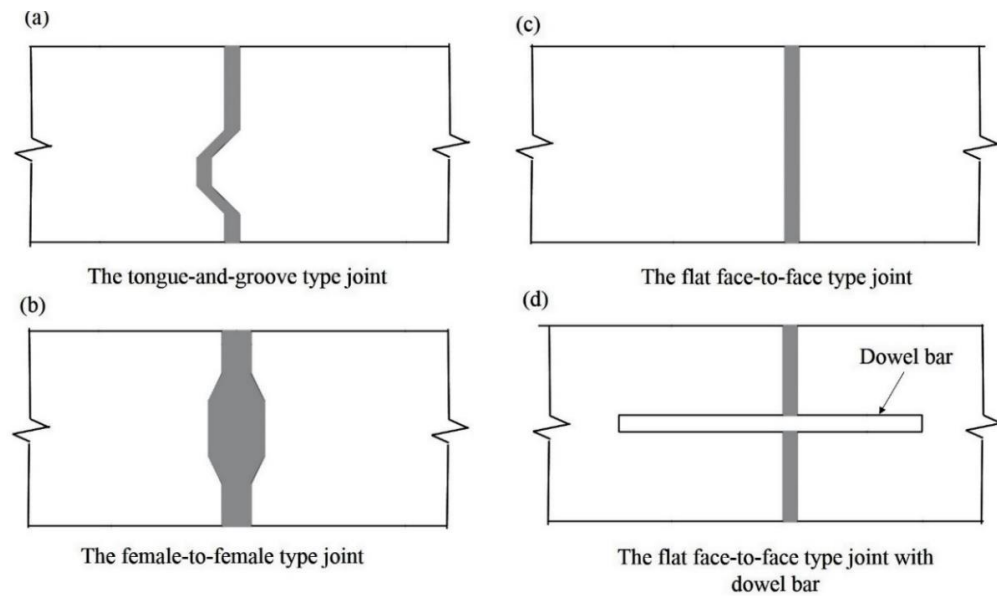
Configuration of the joints: (a) the tongue-and-groove joint, (b) the female-to-female joint, (c) the flat face-to-face joint, and (d) the flat face-to-face joint with the dowel bar
